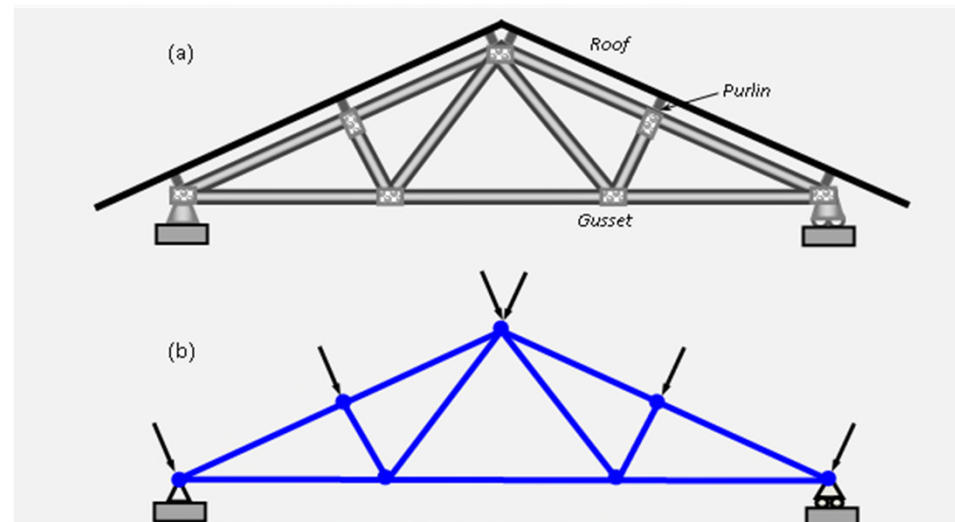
Modeling of a planar roof truss: (a) Physical structure (b) Discrete model.
